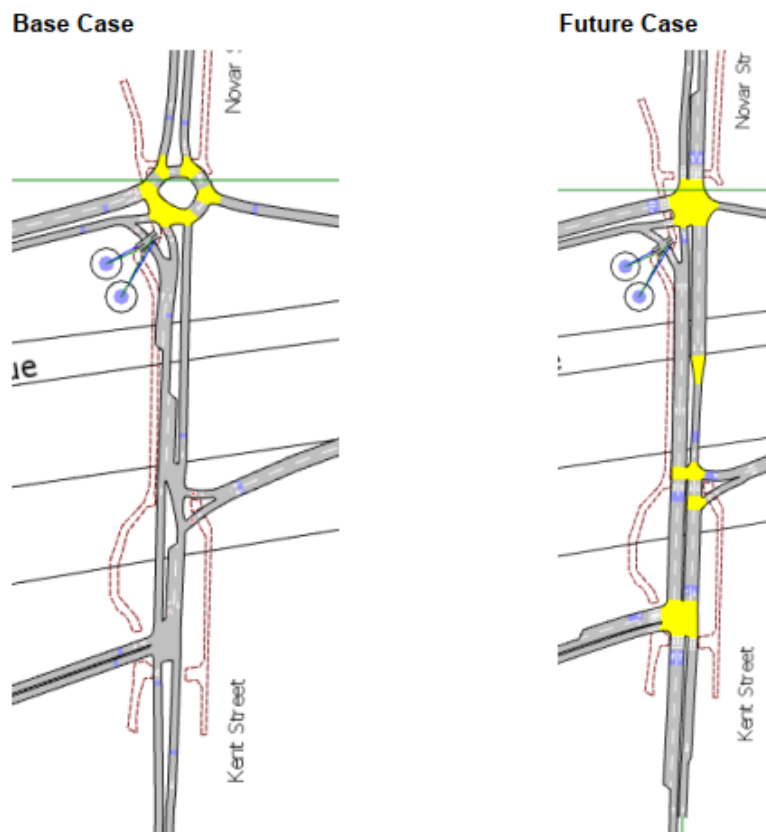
Kent Street Proposed Future Design from the Yarralumla Brickworks Report
